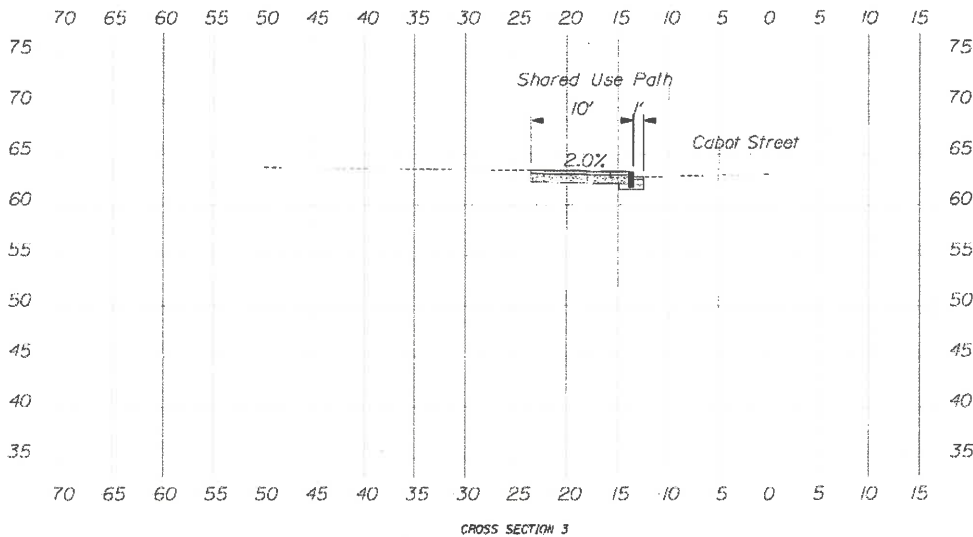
Alternative 2 Cabot St. Cross-Section
